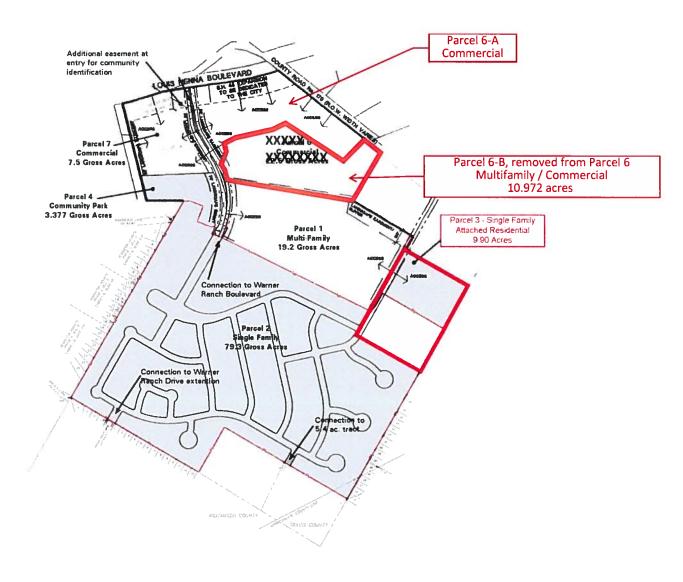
Warner Ranch PUD Plan Street arrangement is diagrammatic only.
